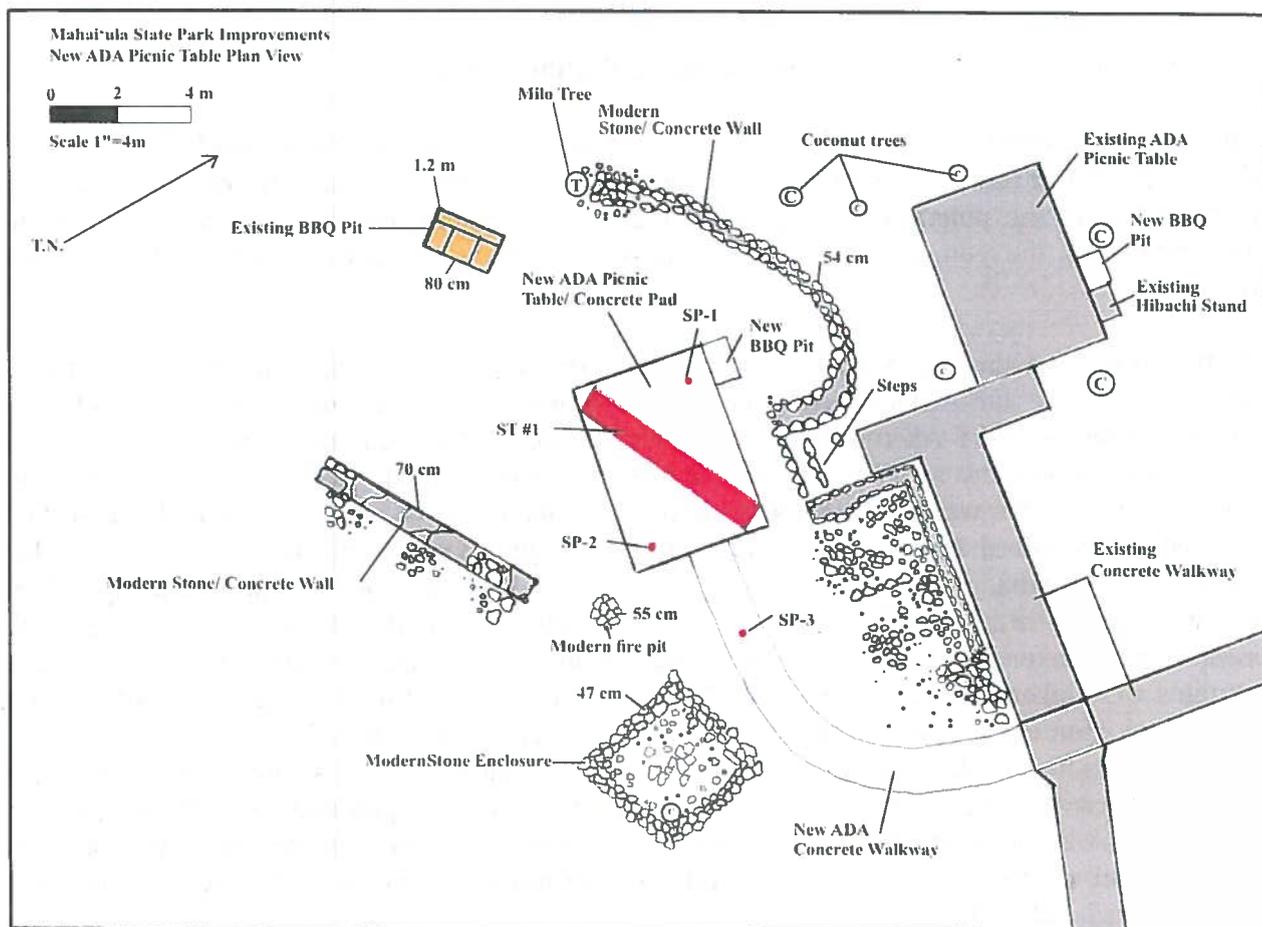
Plan view showing the locations of Strat Trench #1 (ST #1), and Shovel Probes 1-3 (SP 1-3) in relation to the new ADA picnic table, concrete pad, walkway, and 2 new BBQ Pits.
